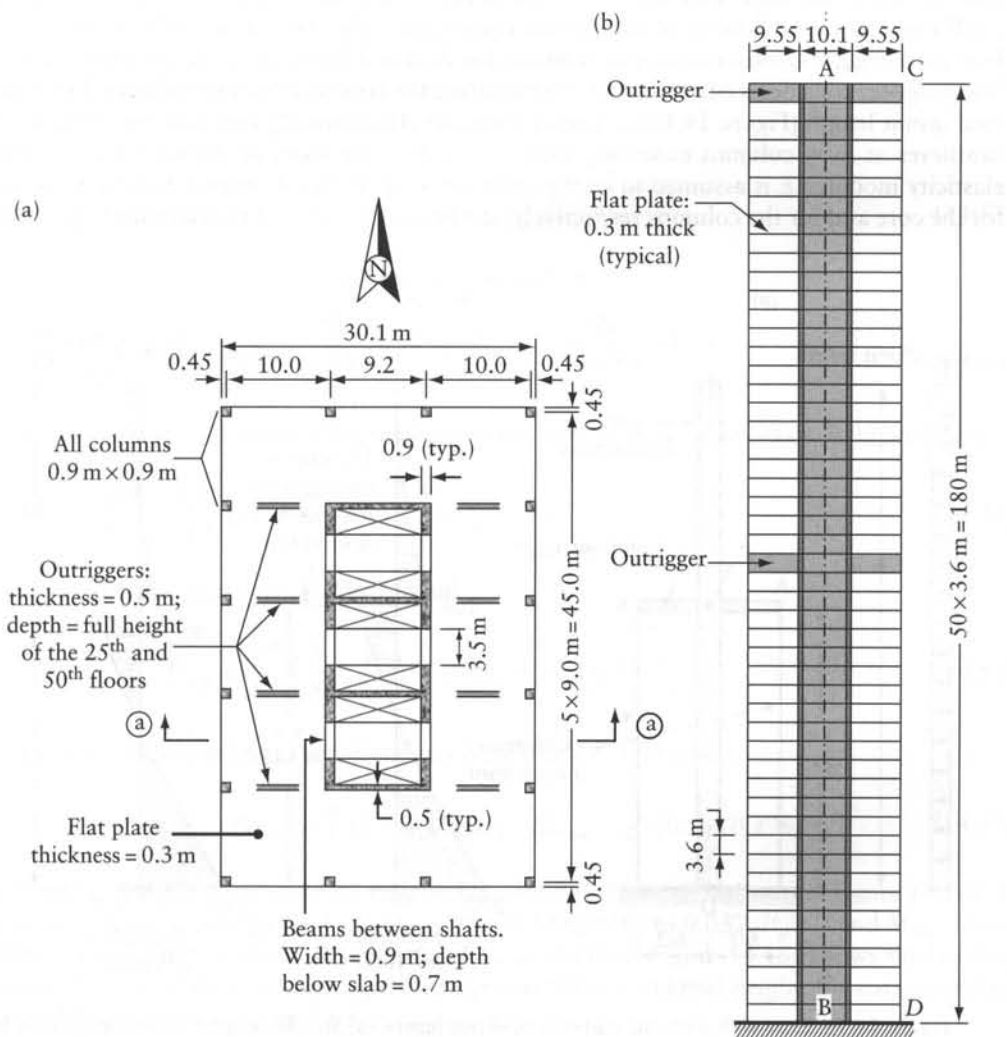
Tall building with outriggers (Example 14.4). (a) Plan of a typical floor. (b) Sectional elevation a-a.
